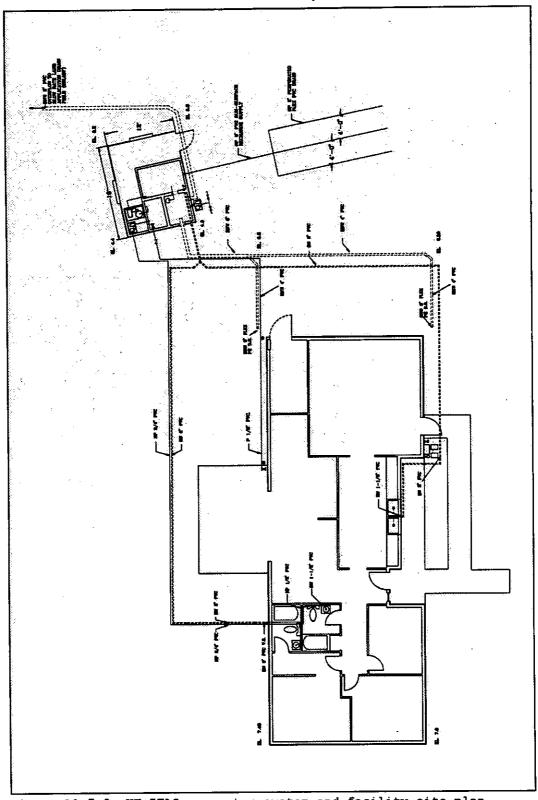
UF-IFAS greywater system and facility site plan. Grosskopf, Kevin R. University of Florida, 1994.
